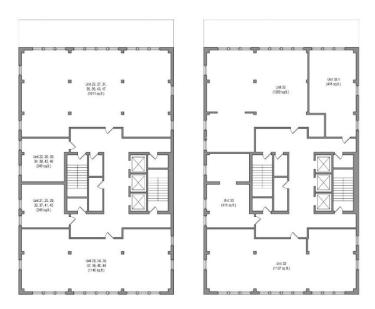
, 309 (left to right): Building 10, ninth floor (1921); same floor (1979). 1" = 32'. North is up.
